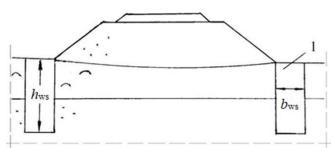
Diagram of reinforcing embankment footing on the swamp: 1 – reinforced soil; b_{ws} is the width of the wall in the soil; h_{ws} is the reinforcement depth
